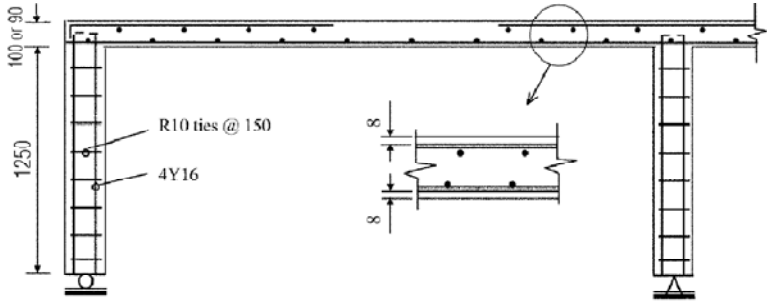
Slab and column Section 1-1 for slab specimens (Gilbert and Guo, 2005).
